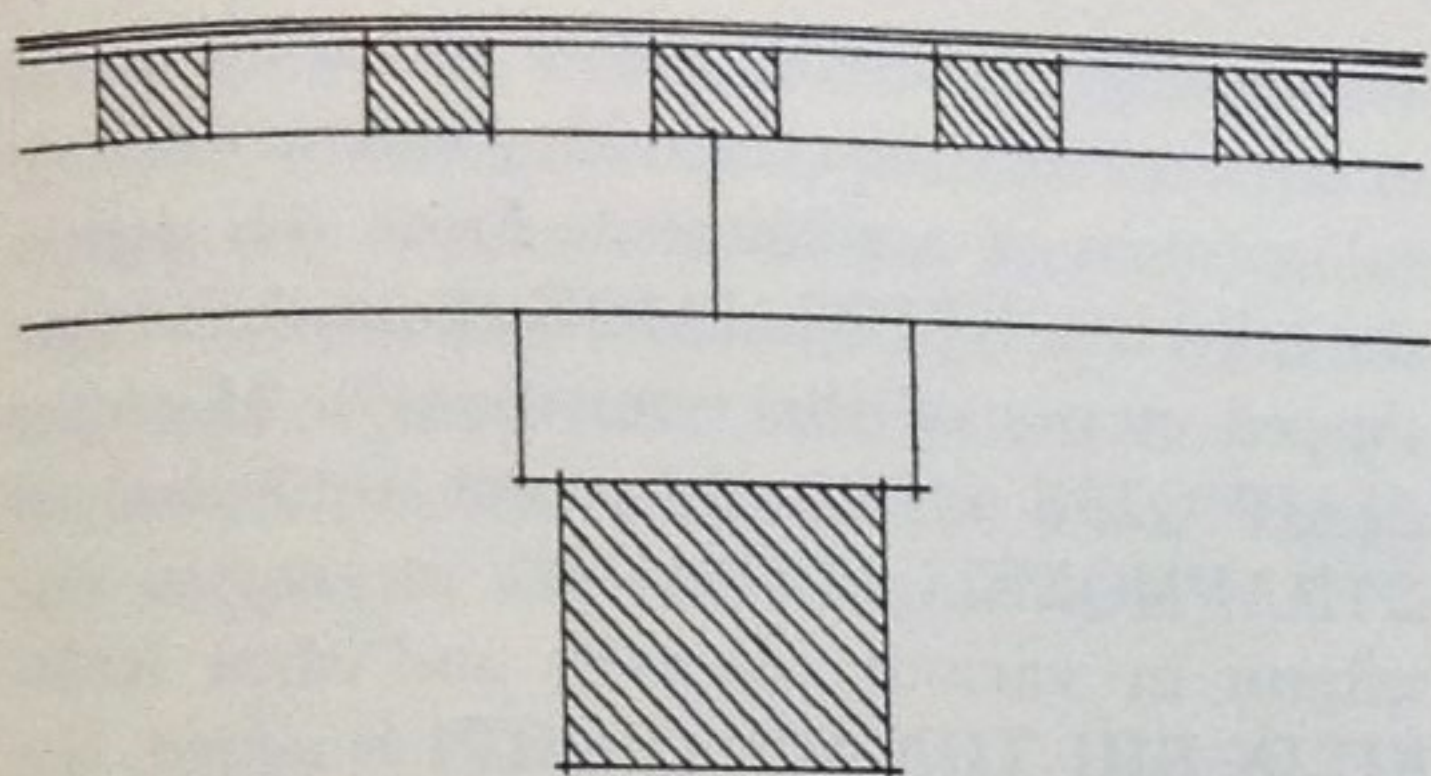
The roof construction proposed by Fabricius, Dörpfeld and Choisy.
